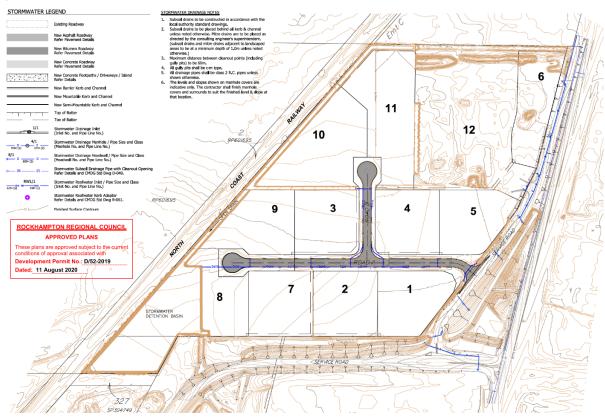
Stormwater Layout Entire Development of 777 Yaamba Road
